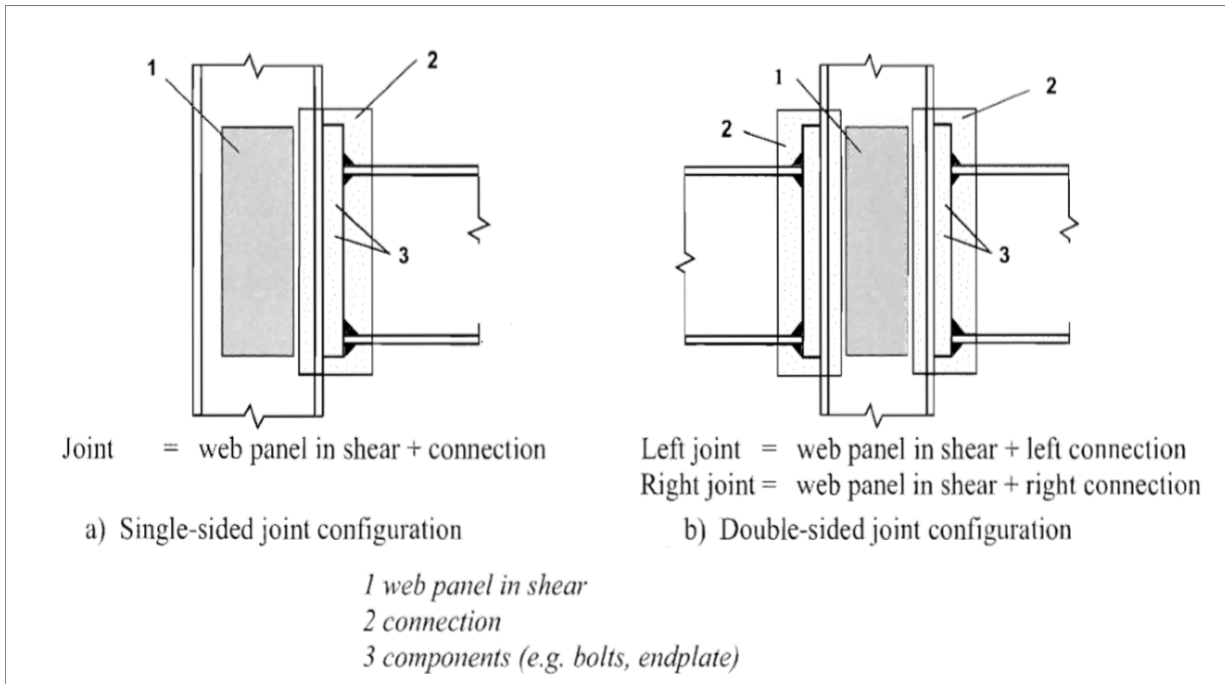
Single-sided steel joint and double-sided steel joint. [5]
